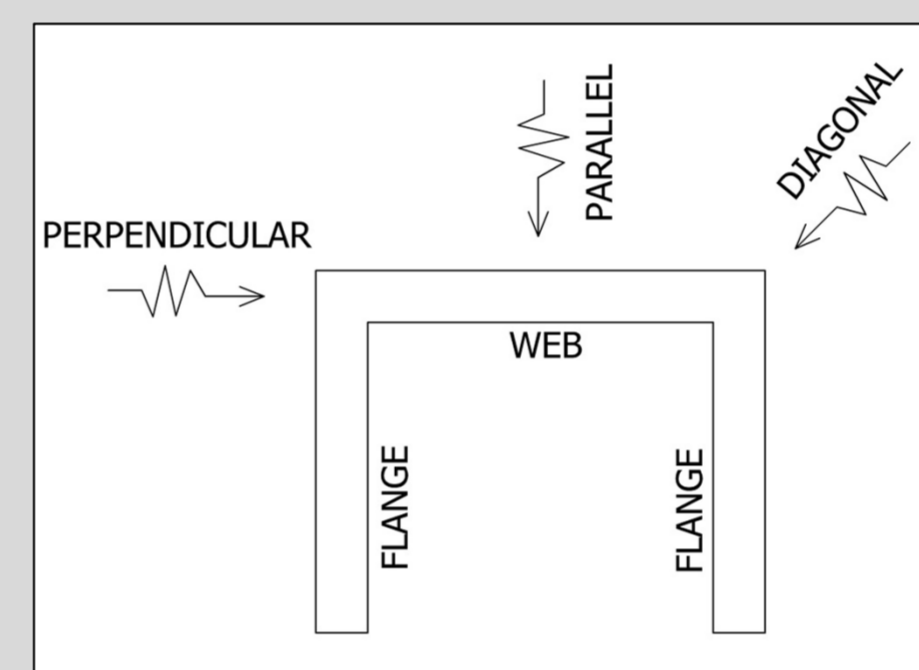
Plan view for U-shaped wall with possible earthquake loading directions
